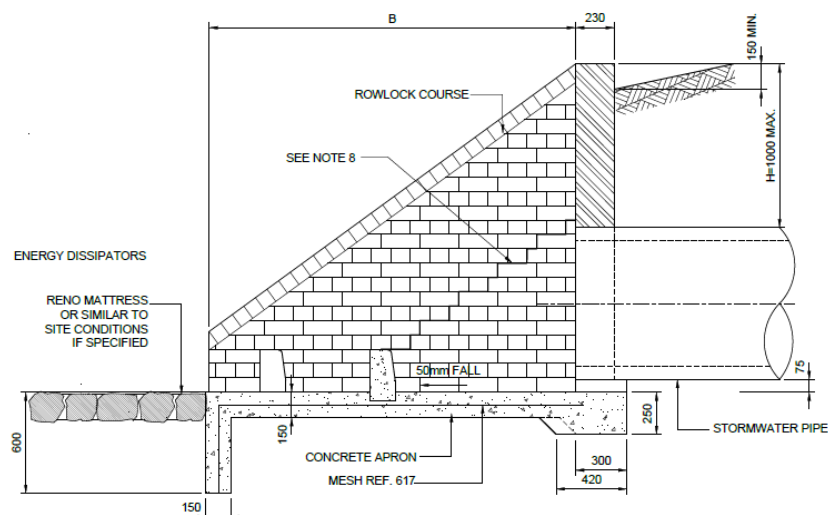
Typical Stormwater Headwall with Energy Dissipators
